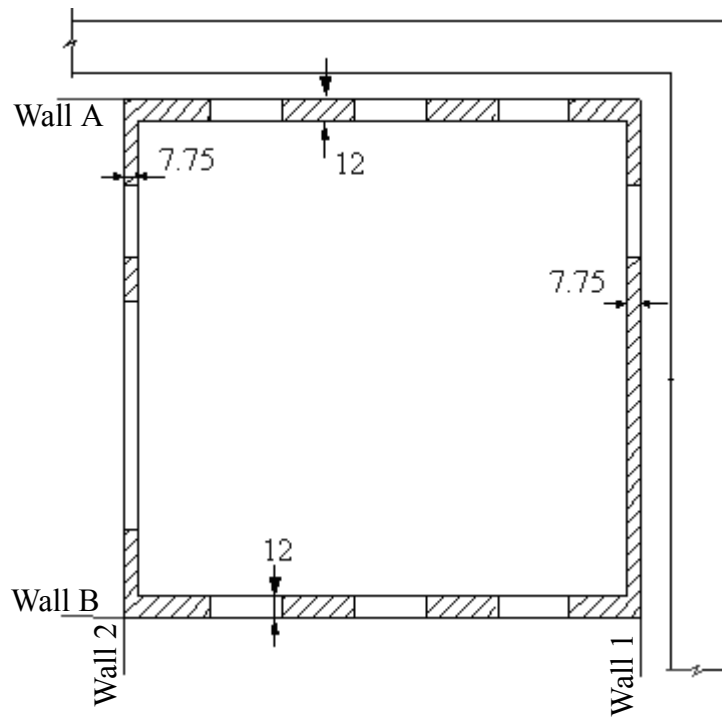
Plan view of the test structure (dimensions are in inches).
